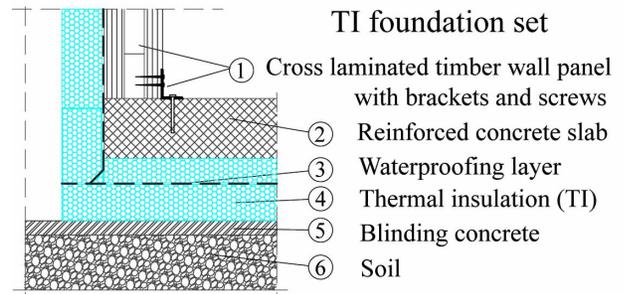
The detail of a TI layer with XPS boards and inserted waterproofing (HI) foil.
